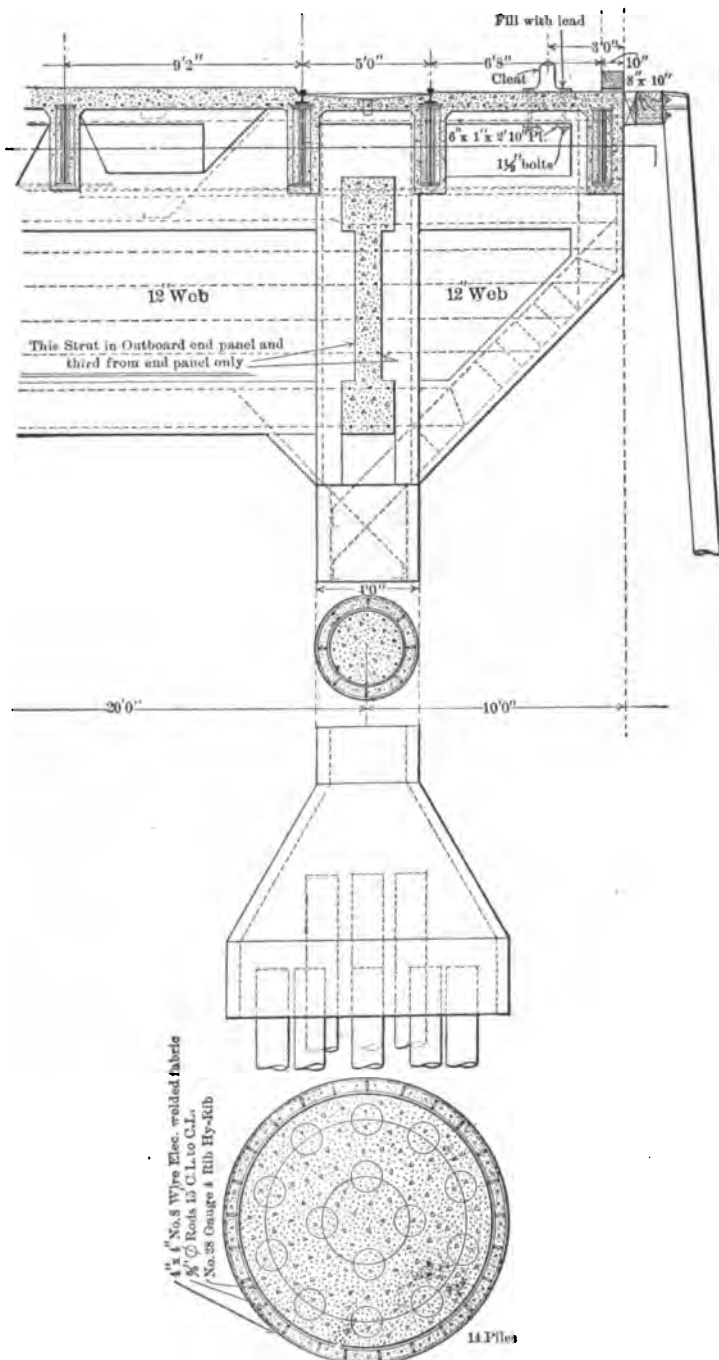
NAVY CONCRETE PIER, DETAILS.
